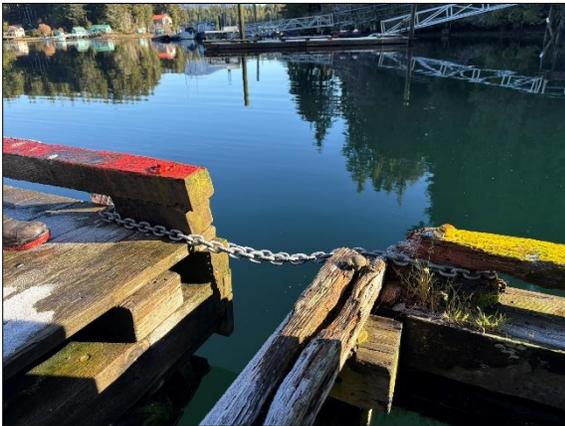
Float A bull rail at 7.0m east side, note: decayed bull rail at connections
